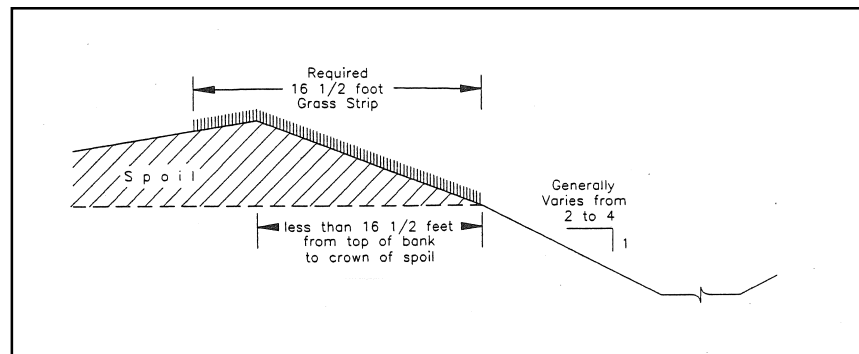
Typical Ditch Section with Less than 16½ ft. from Top of Channel Bank to Crown of Spoil Bank
